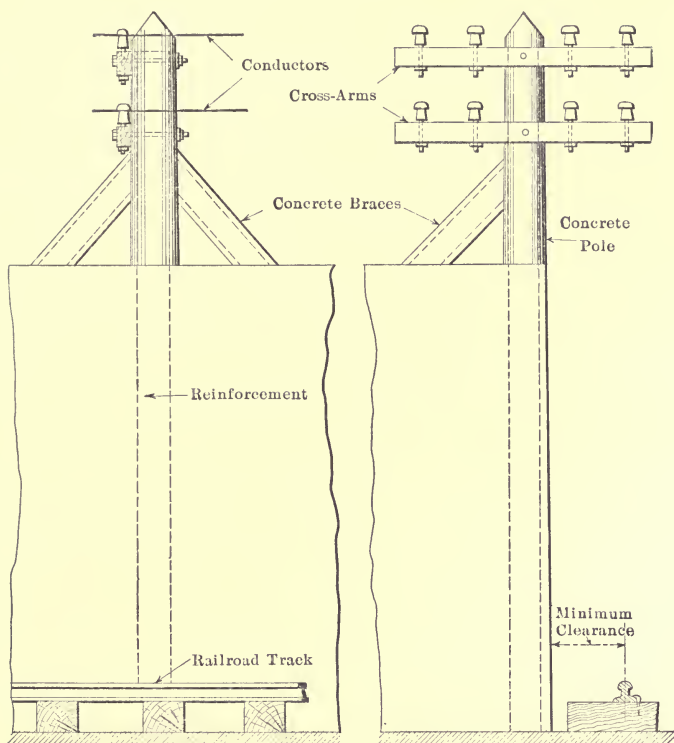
CONCRETE POLE INTEGRAL WITH BUILDING TO SAVE SPACE.
